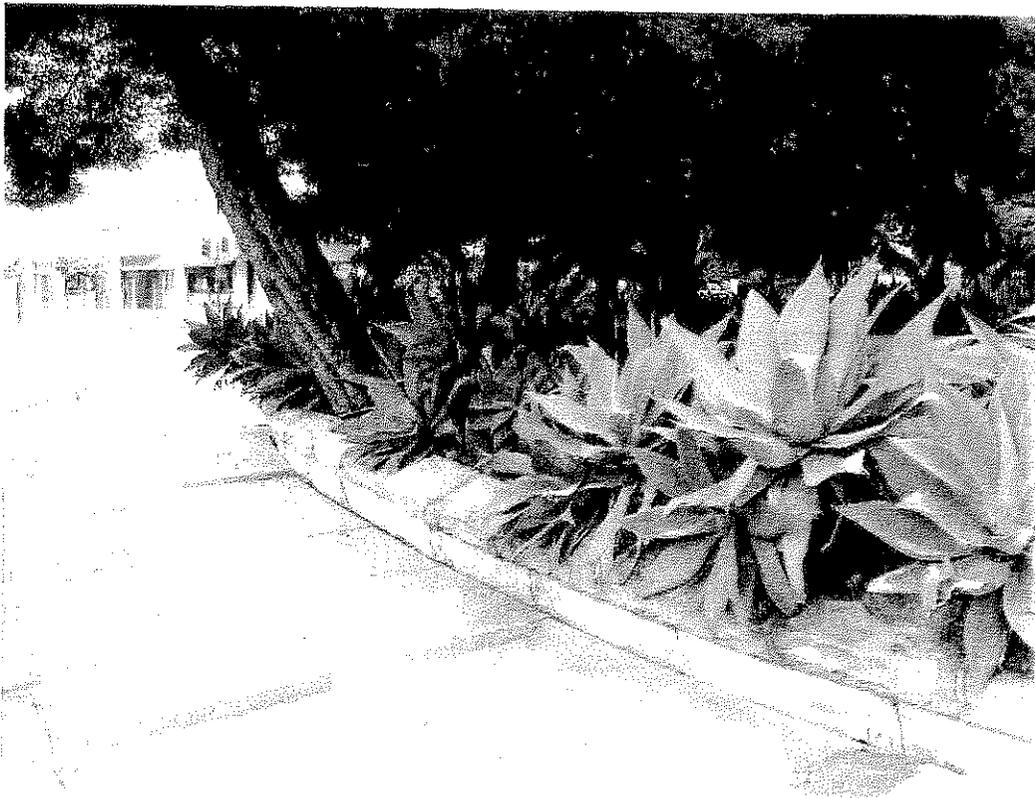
View showing how black acacia and landscaping is pushing the sandstone wall out of alignment. Facing west. A. C. Cole. July 2006
